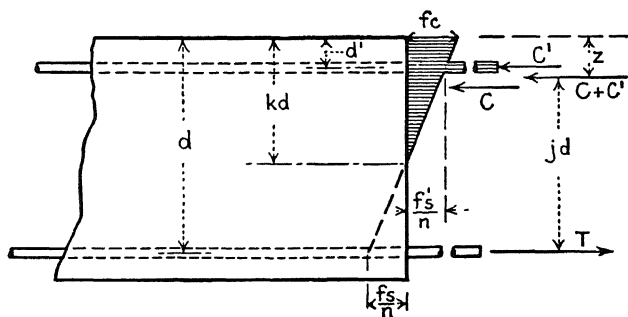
Nomenclature for Concrete Beam Reinforced for Tension and Compression.
